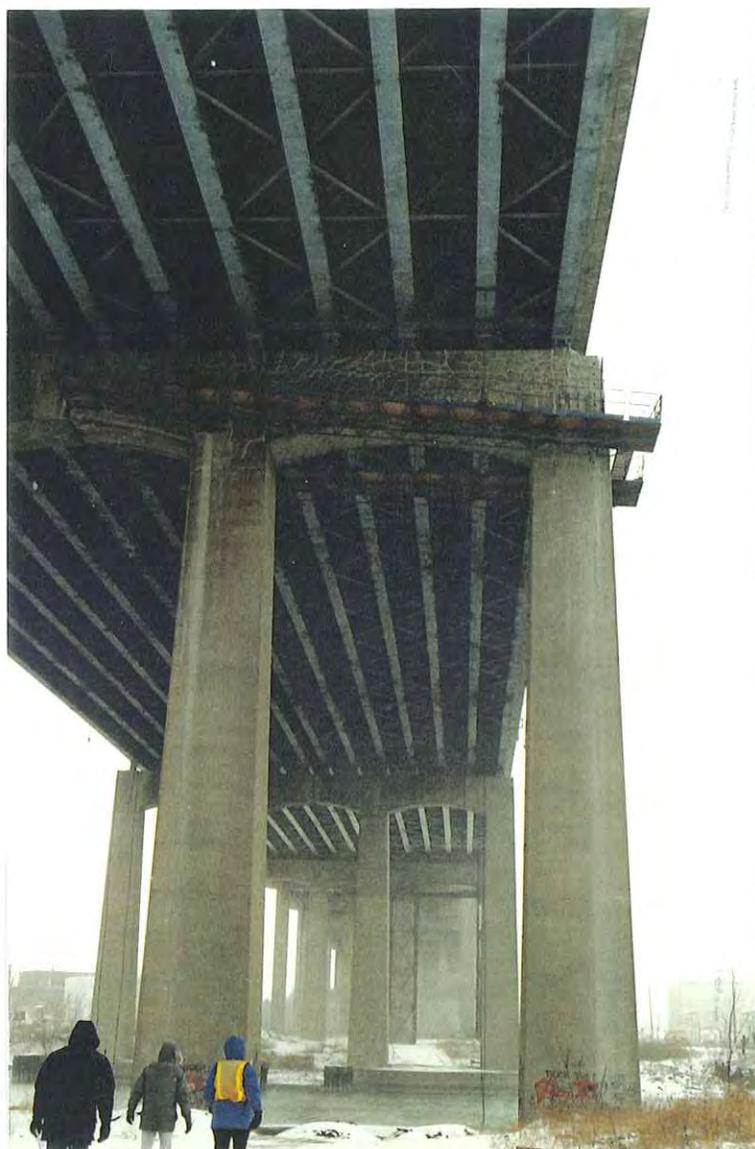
Overview of the main span of the bridge looking south, showing epoxy injected Pier Cap 39 in the foreground, and Piers 38 and 37 in the background.
